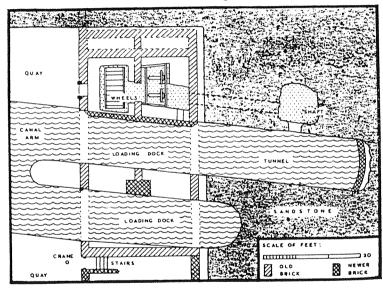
Plan of the Ground Floor of the Grocers Warehouse in 1960.
